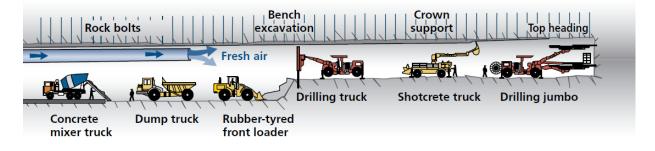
Sketch of drill and blast method (Unterschütz 2004).
